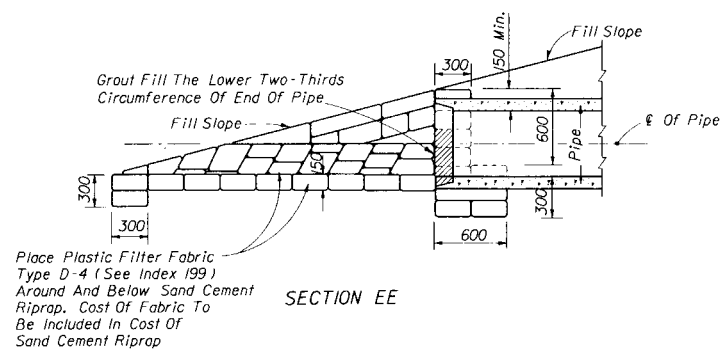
DETAILS FOR SINGLE METAL PIPE ARCH CULVERTS
